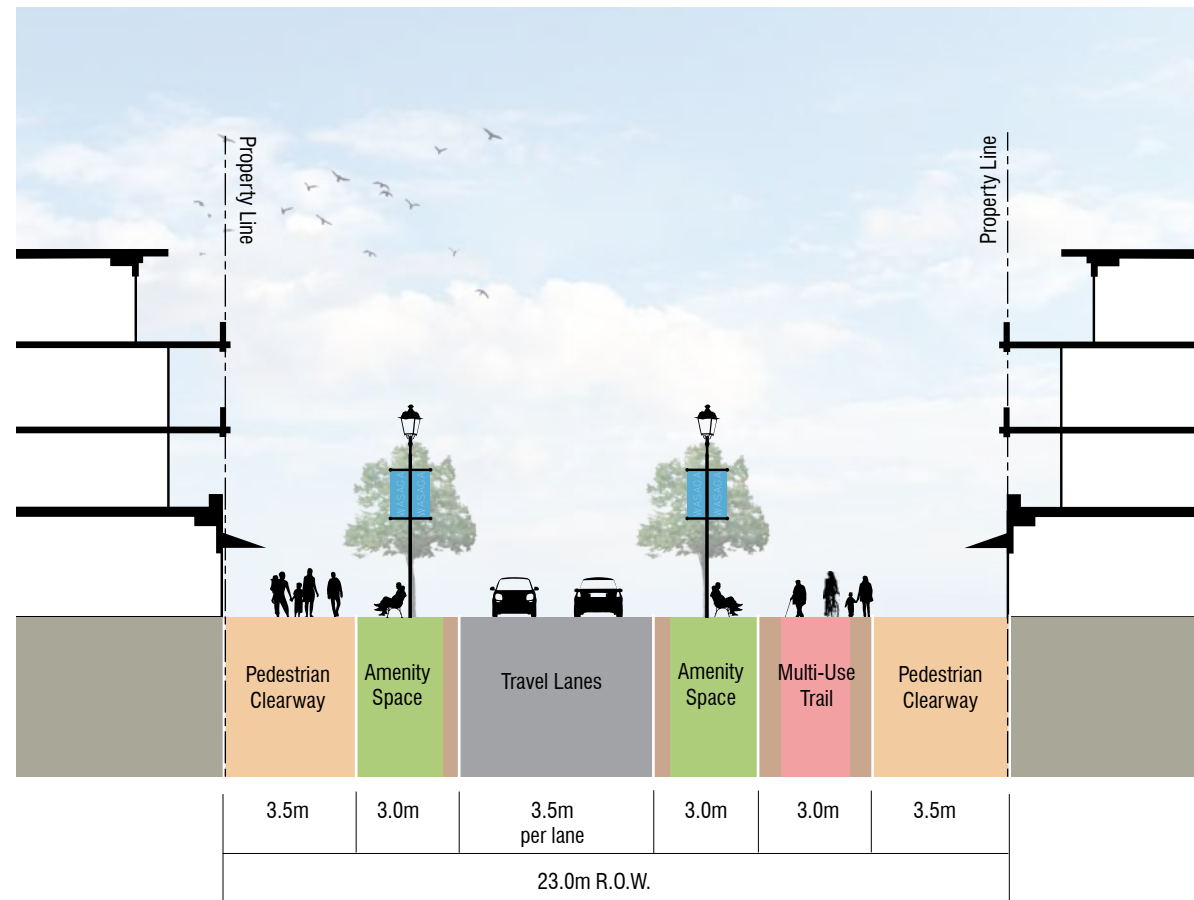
Mosley Street Section (23.0 m R.O.W.)
